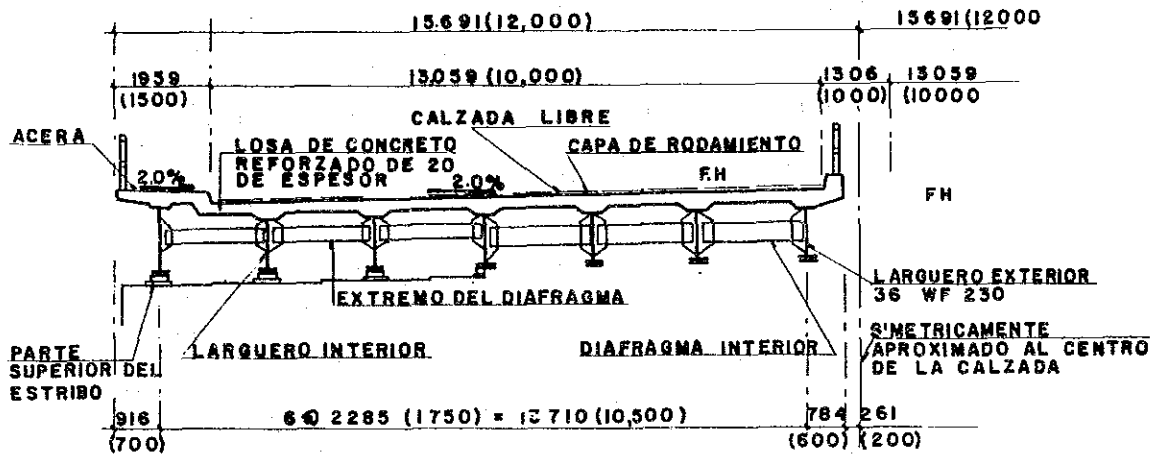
Typical Superstructure Section of El Arroyo Bridge, Composite Beam
